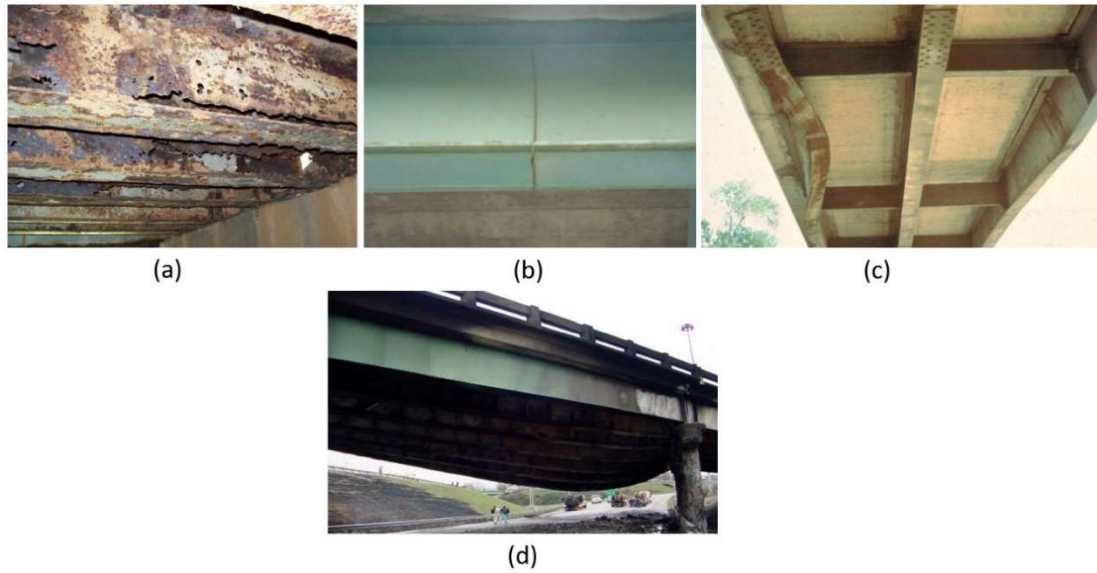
Examples of steel defects. (a) Corrosion and section loss, (b) Fatigue cracking, (c) Collision damage, (d) Heat damage [7].
